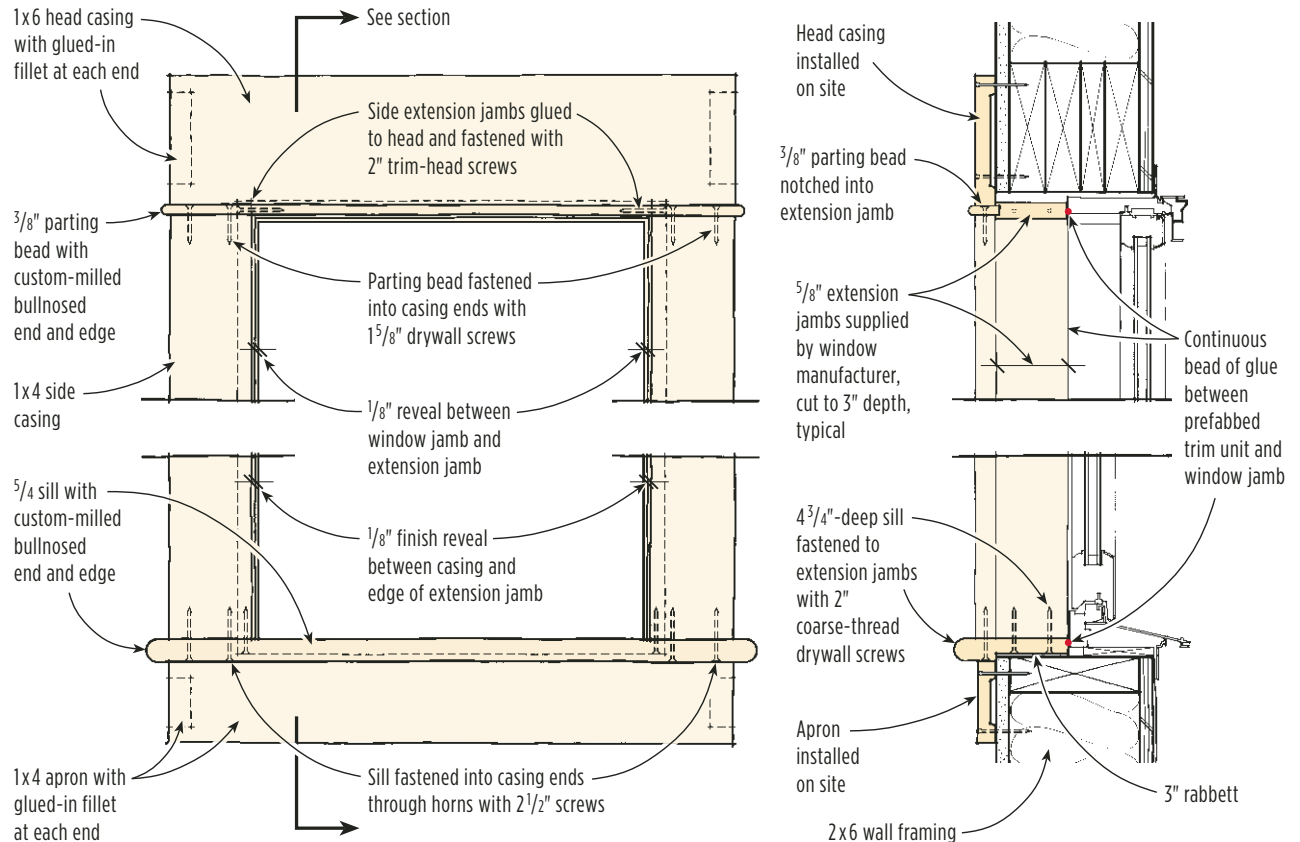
Window trim kits ship to the site in three pieces: the jamb extensions with sill, side casings, and parting bead attached; the head casing; and the apron.
